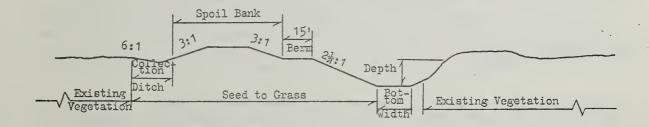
TYPICAL CHANNEL CROSS SECTION CENTERLINE DRAIN
